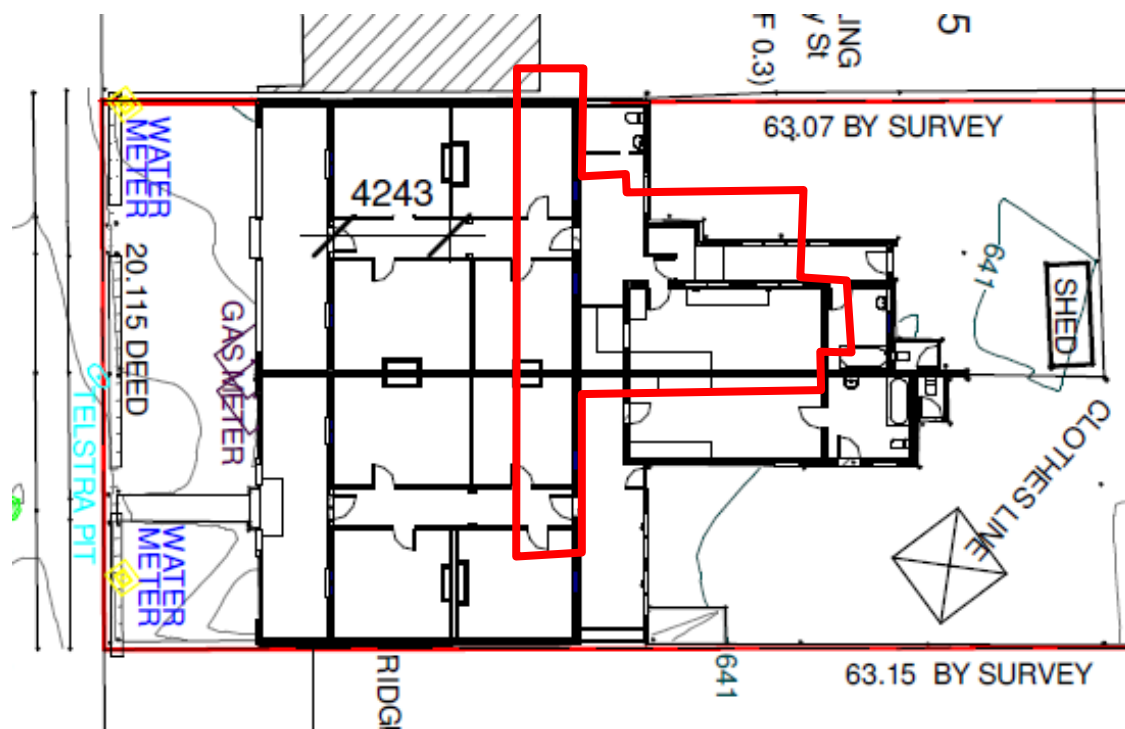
61-63 Bradley Street – existing buildings proposed areas of demolition highlighted in red. (Source: TLA)
